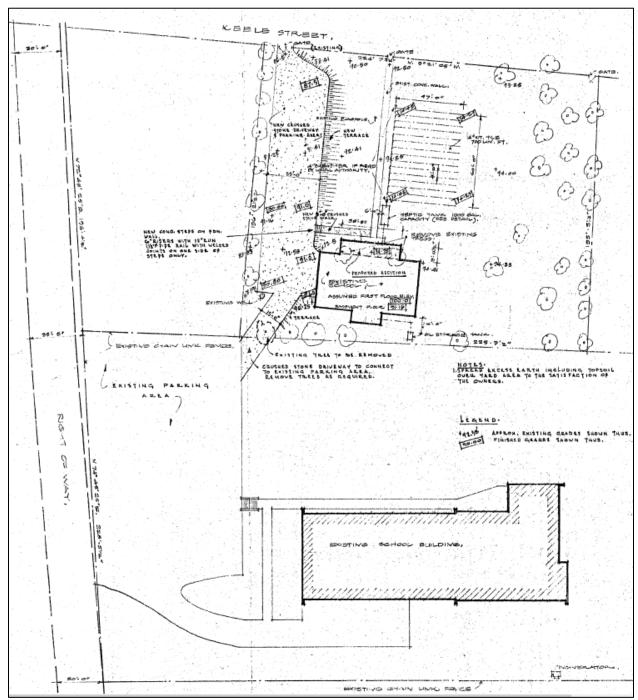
Site plan for the 1960 addition to the c.1896 schoolhouse and parking (York Region District School Board)
